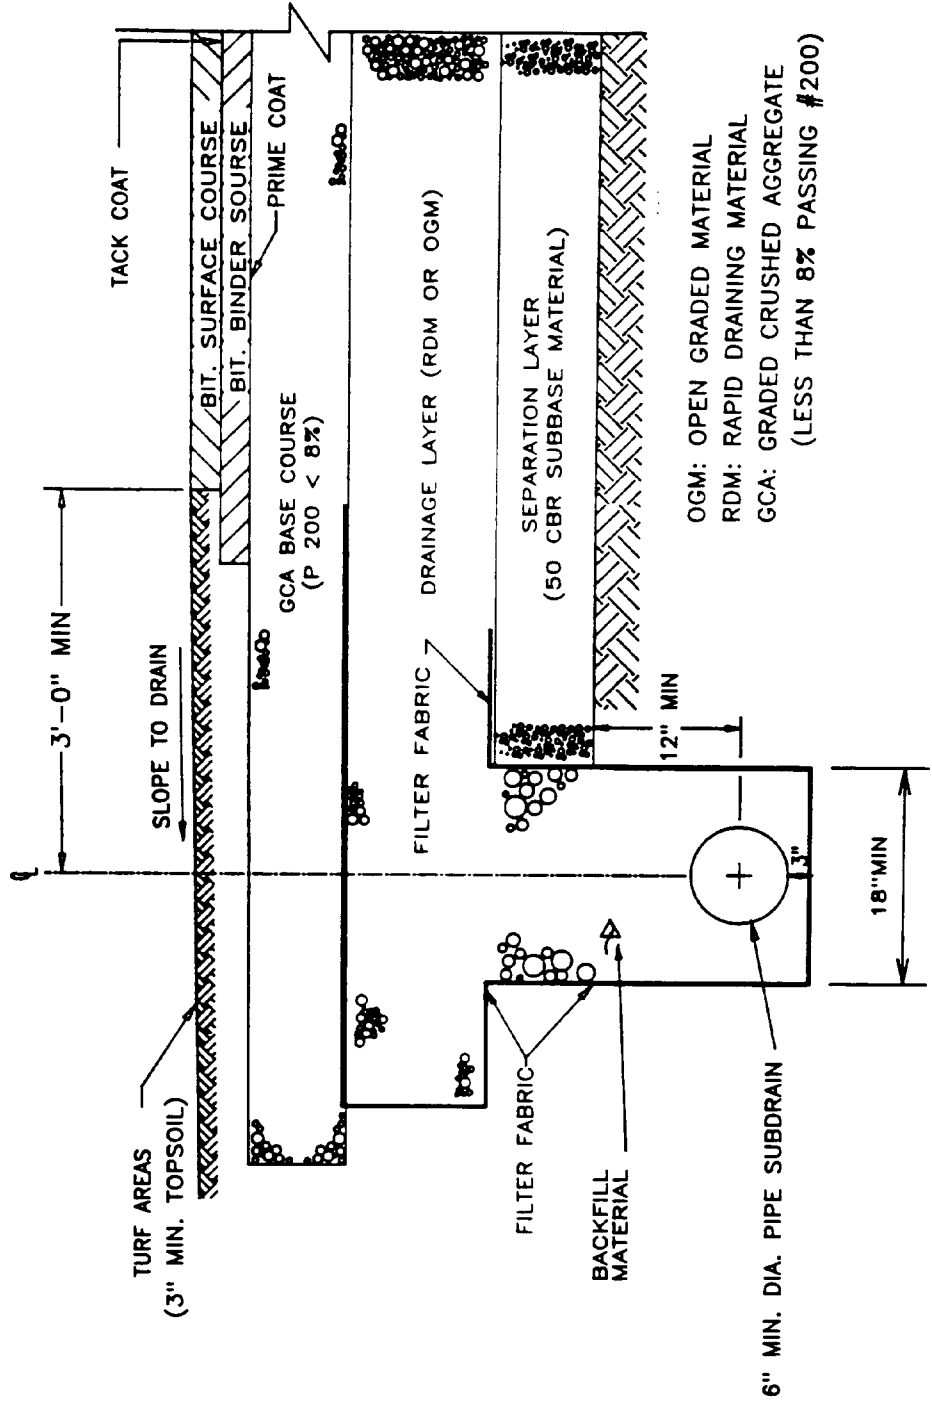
Typical Pavement Edge Subdrain for Bituminous Pavements
